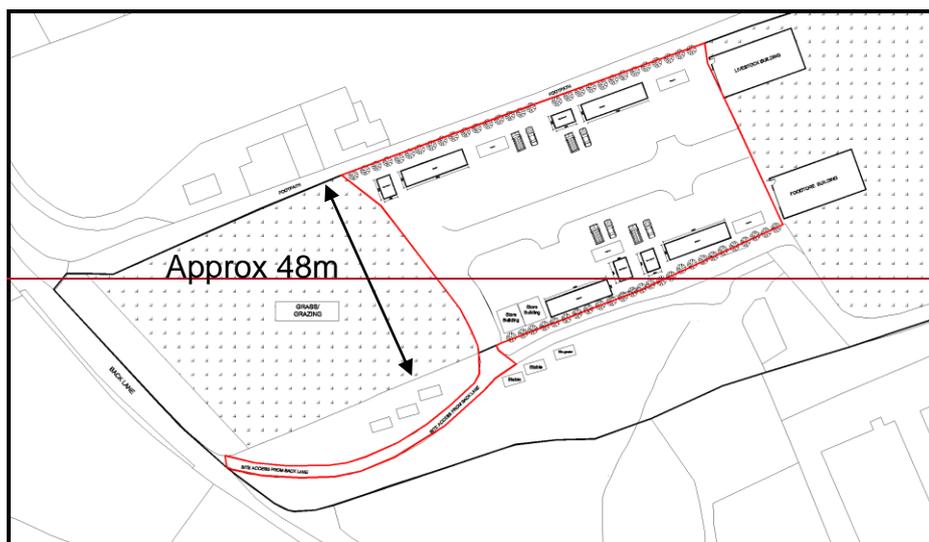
Plan illustrating the site and the proposed layout of pitches. Extract from submitted plans.
